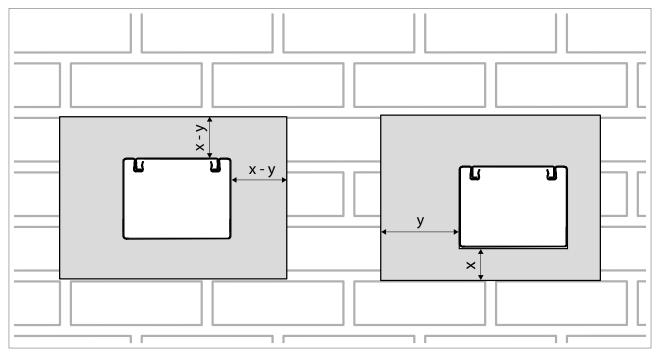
Symmetric and asymmetric arrangement for the wall connection or wall penetration
